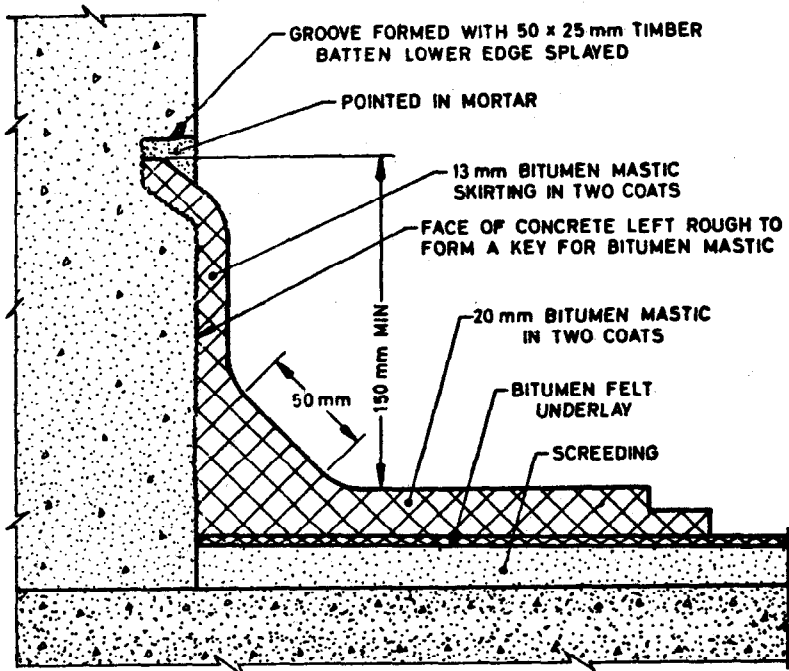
BITUMEN MASTIC LAID ON SCREEDED ROOF AND BITUMEN MASTIC SKIRTING TO CONCRETE WALL
